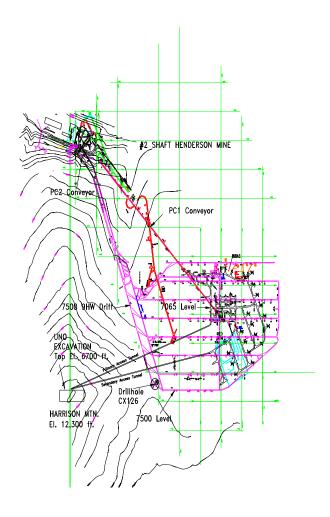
Plan view of Henderson Mine workings and proposed UNO location. (Scale: 500 feet between map gridlines)
